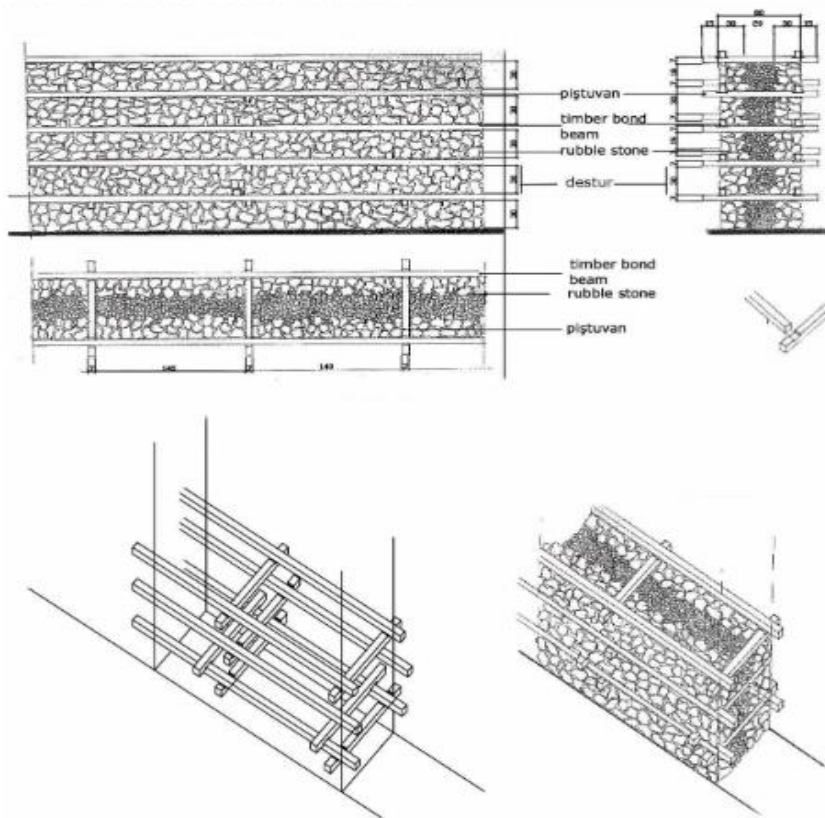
Belenalan' Dry Wall Construction Technique(Çelik, 2009)
